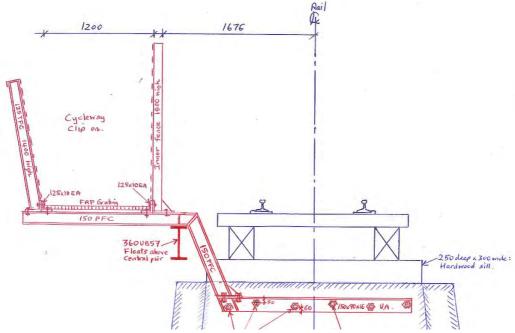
Typical section through cycleway clip on and rail bridge 10 BOIVR.
